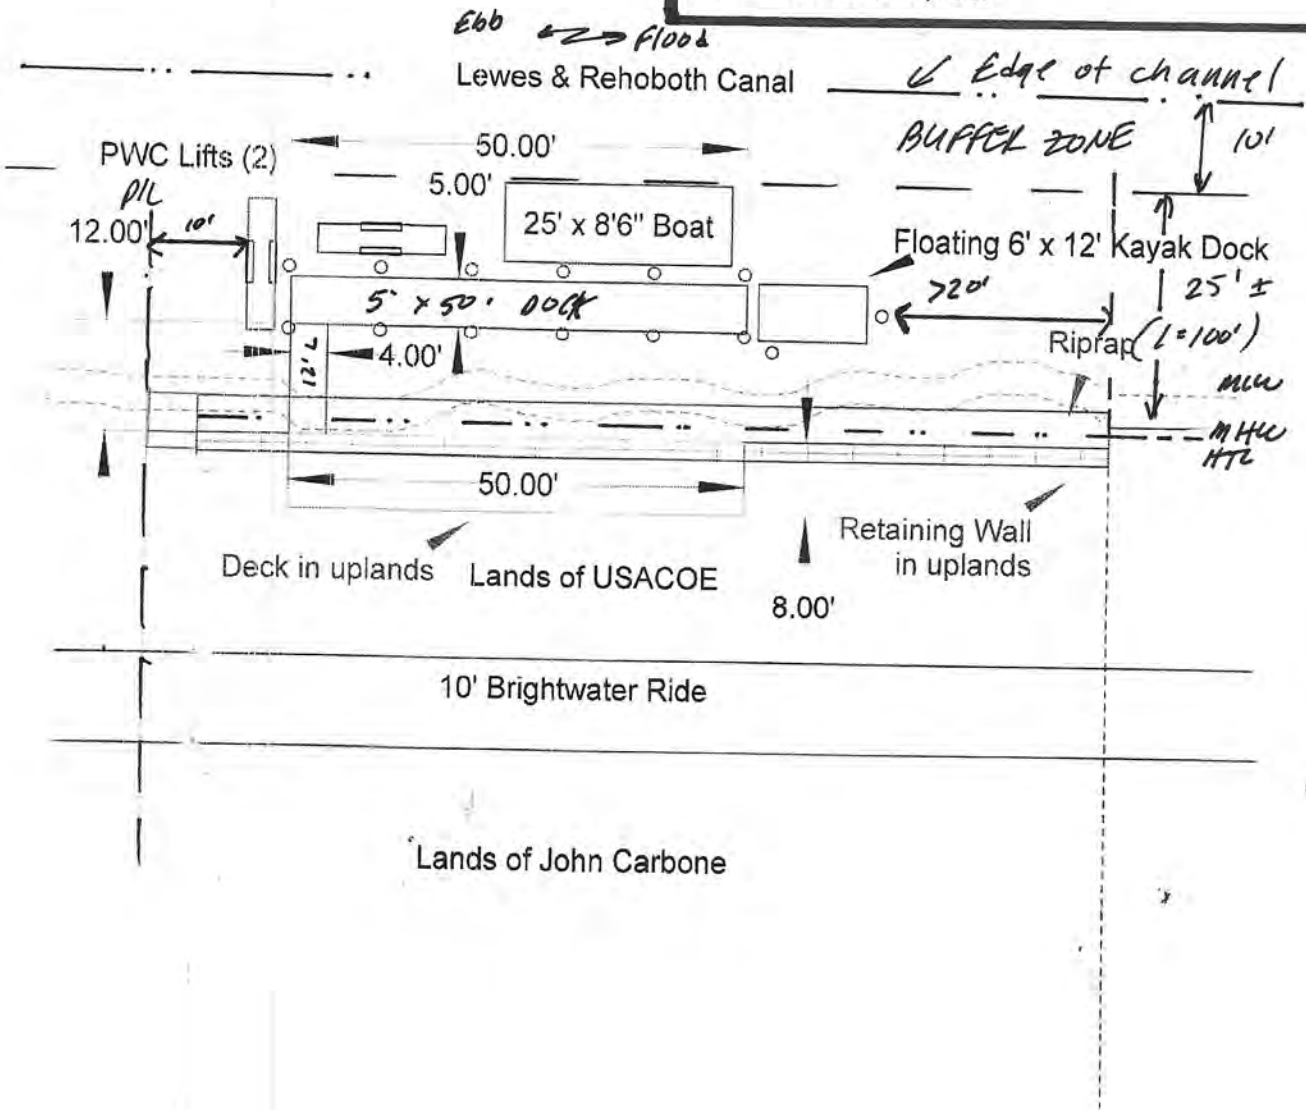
Plan view of proposed project (prepared by Precision Marine Construction, Inc.).
